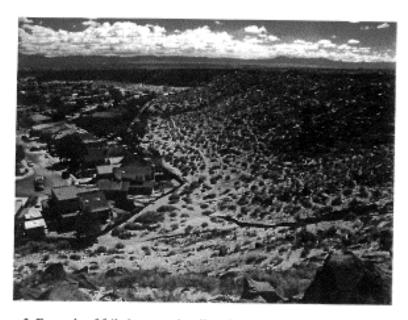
Example of failed rear yard walls at base of escarpment (Rockcress Court, Taylor Ranch)
